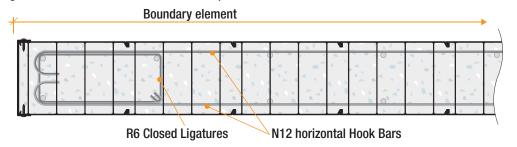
AFS Rediwall® Standard Boundary Element (Alternate Detail)
